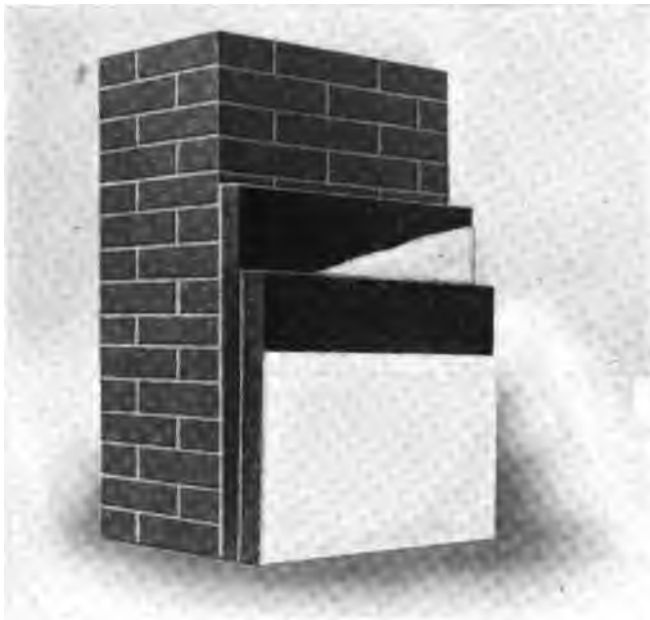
CORK BOARD INSULATION ON BRICK WALL.
